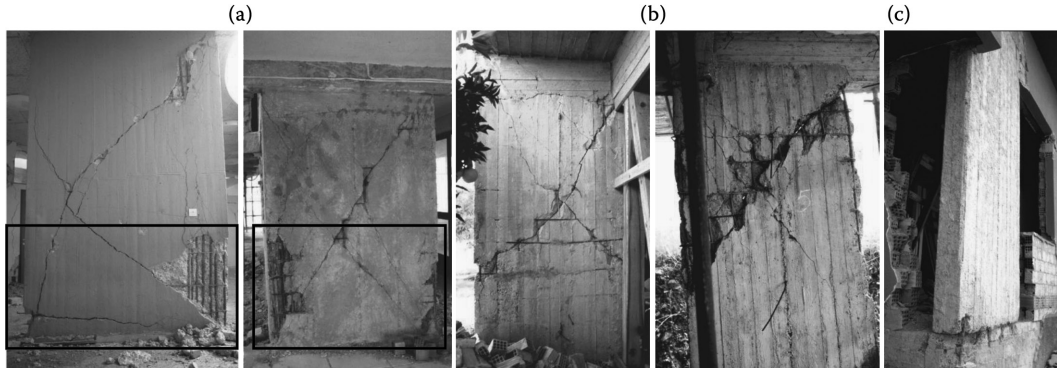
Typical failures of concrete walls: (a) flexural, with damage in shear; (b) in shear; (c) by sliding shear.
